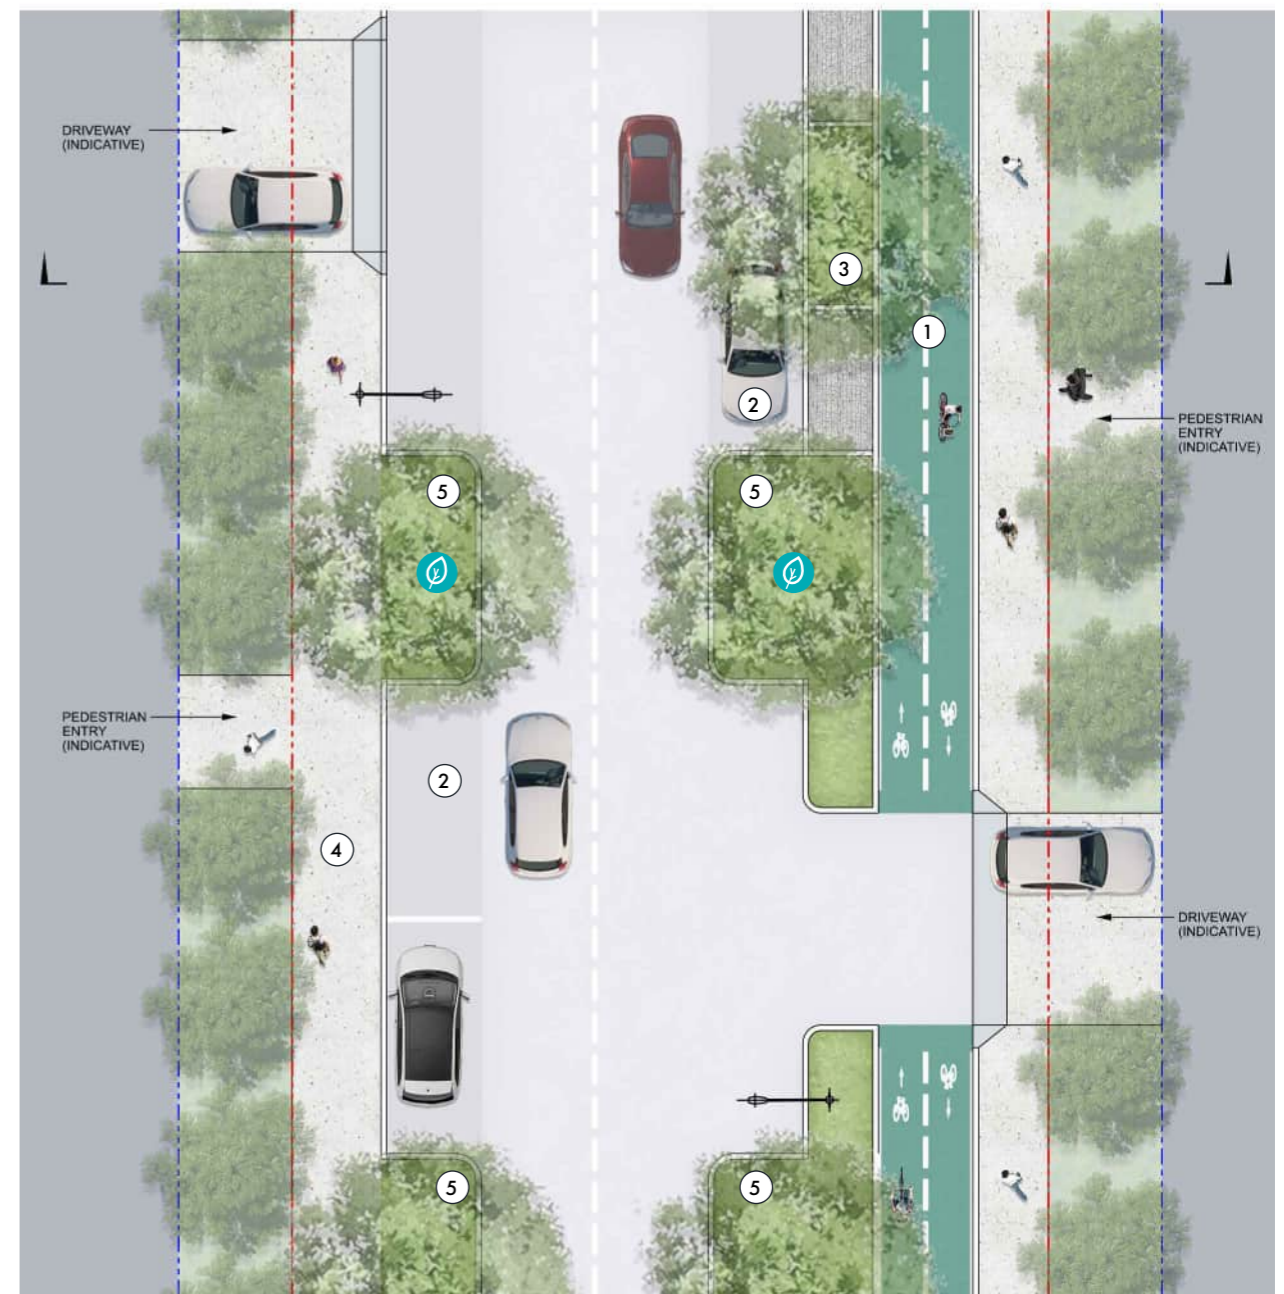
Denham Street, Denham Street Extension (New Street) and Llewellyn Street - Typical Plan
